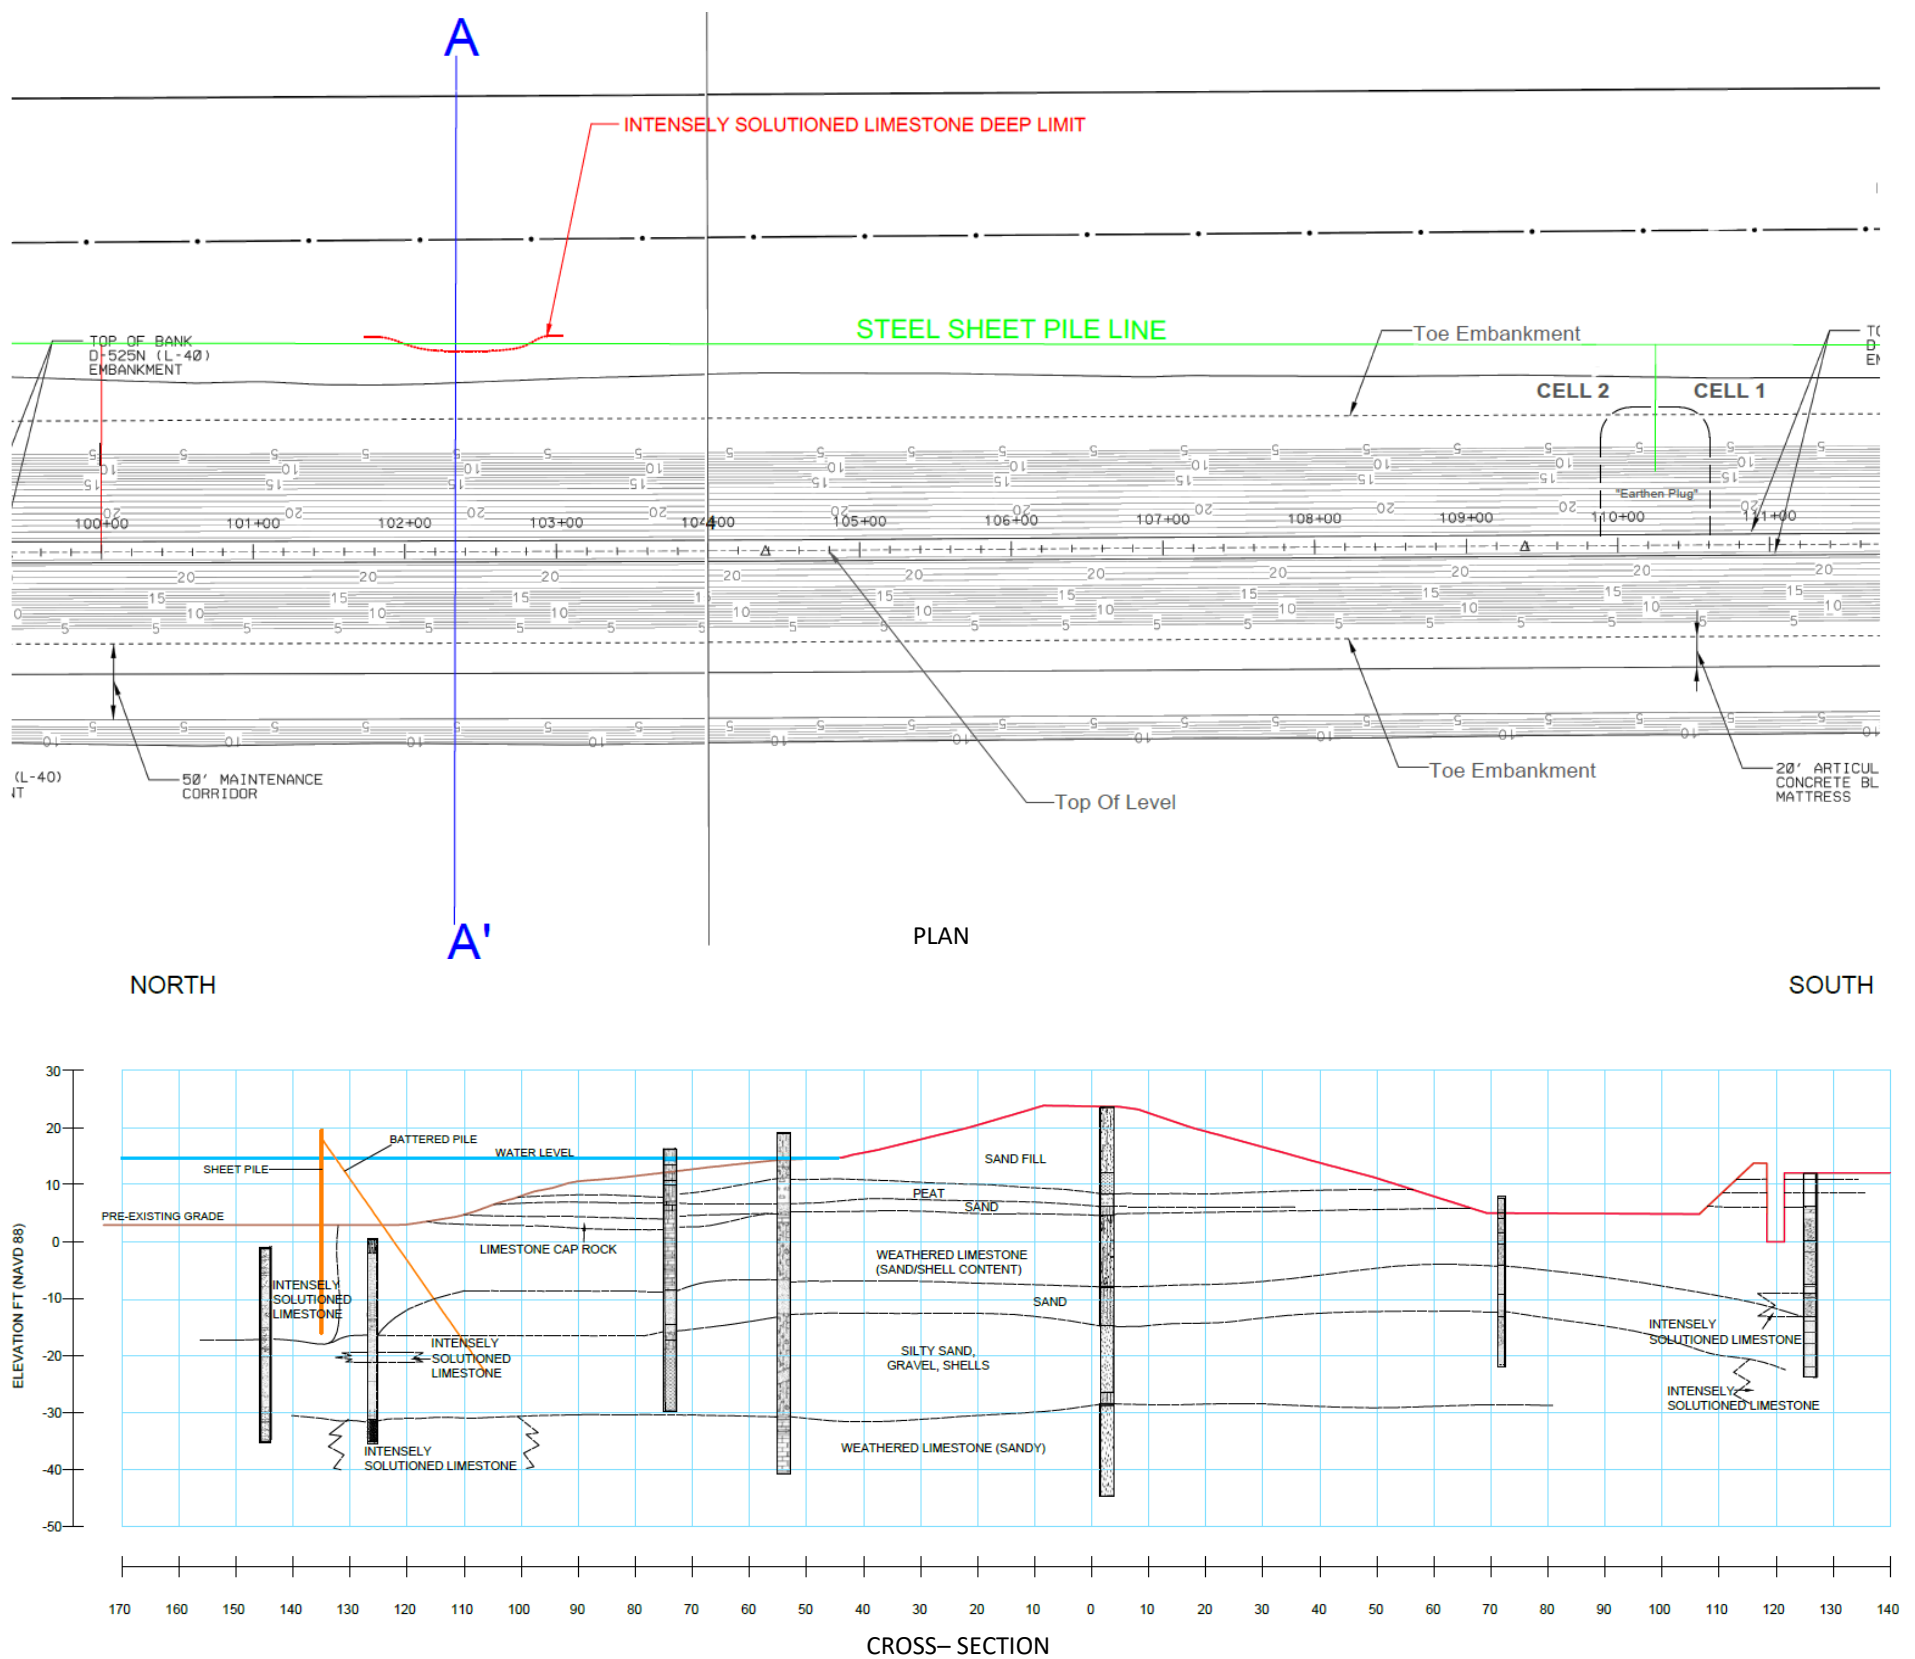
COFFERDAM CONSTRUCTION A -A' ALONG THE EXISTING LEVEE
